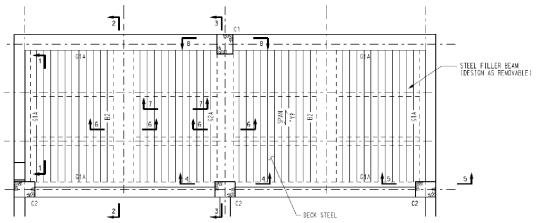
Part of the floor system plan designed in auxiliary building of NPP
